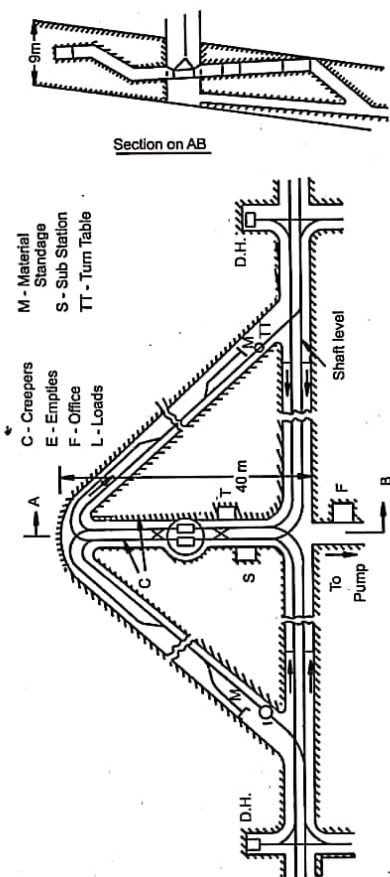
Pit bottom layout in a thick seam with shaft axis along dip and rise
